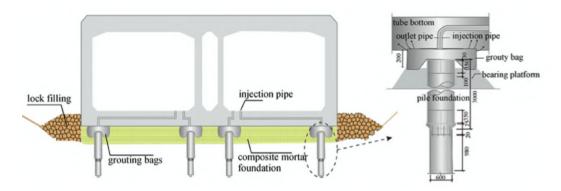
Grouting bag used for Changhong Tunnel (Wang et al, 2020)
